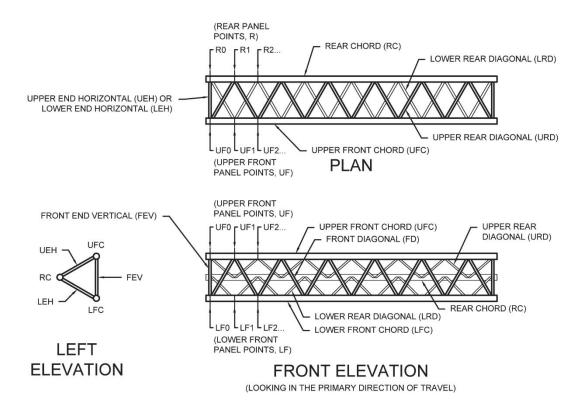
Methodology for Panel Point Numbering and Component Labeling of Tri-Chord Truss Sign Structures without Splices
